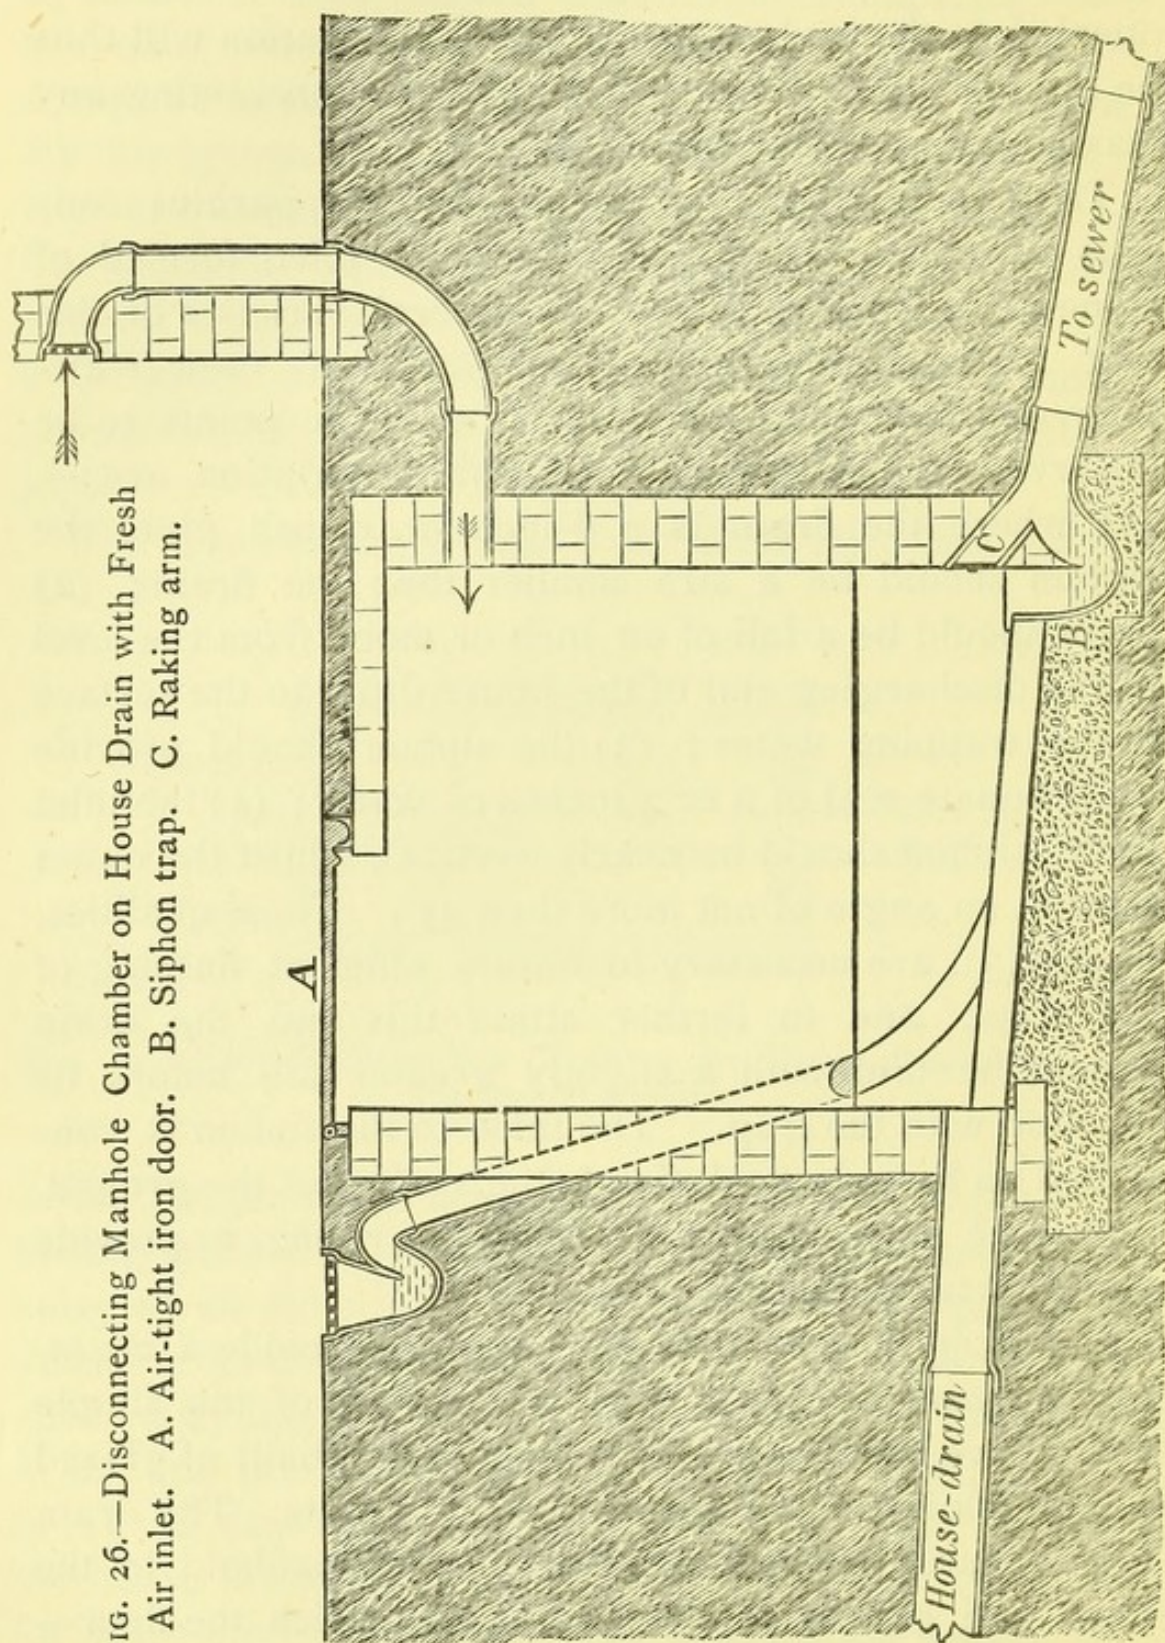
Disconnecting Manhole Chamber on House Drain with Fresh Air inlet. A. Air-tight iron door. B. Siphon trap. C. Raking arm.
